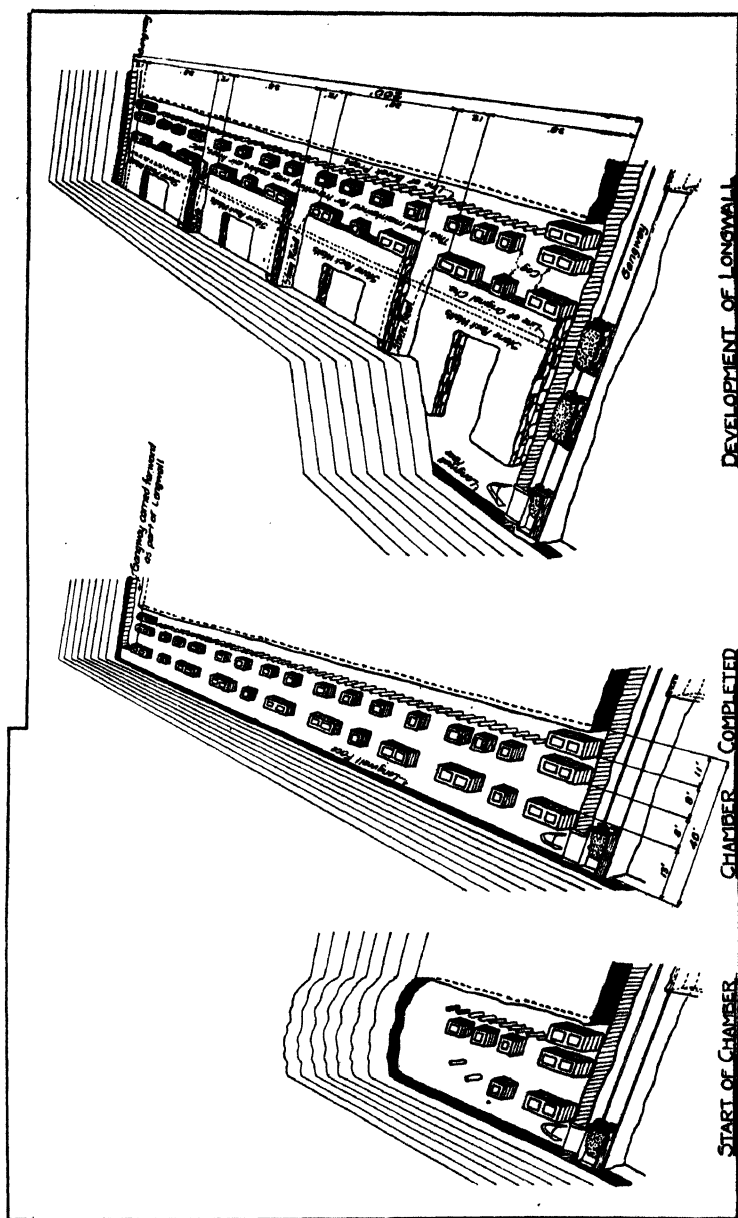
(a).—LONGWALL WITH ROCK-PACKED ROADS.
